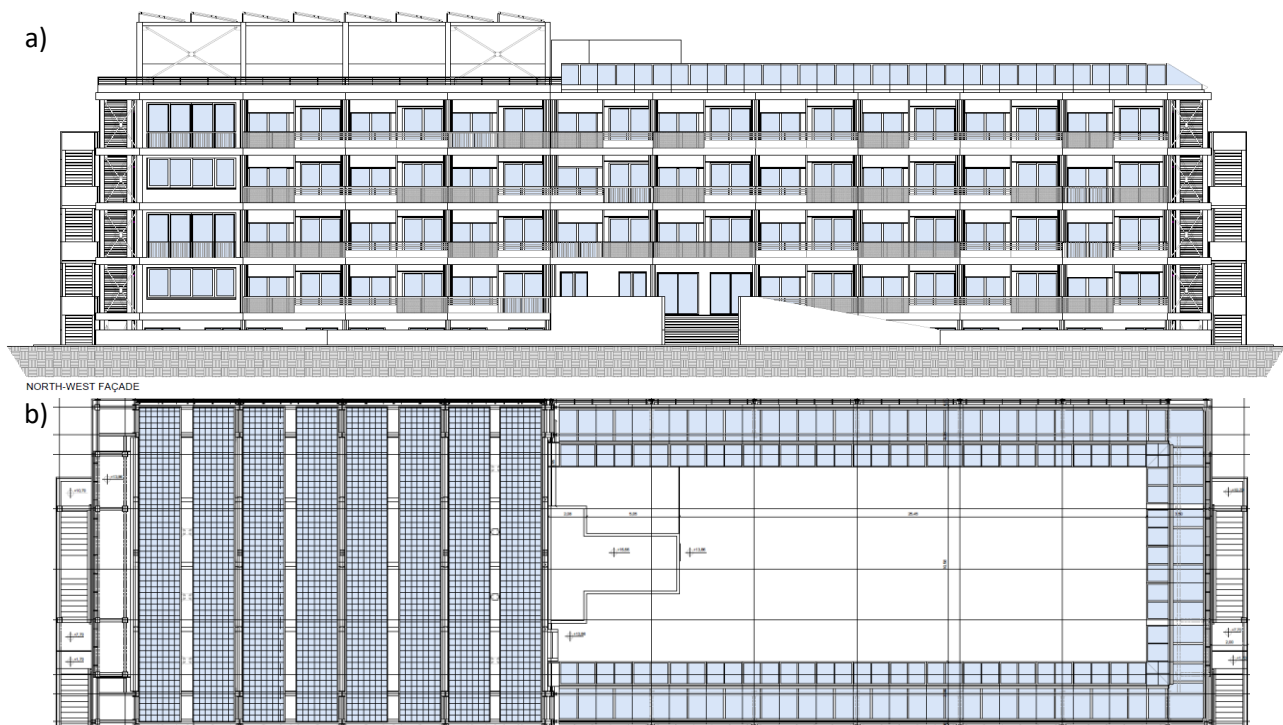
a) North-west façade; b) plan view of the rooftop floor
